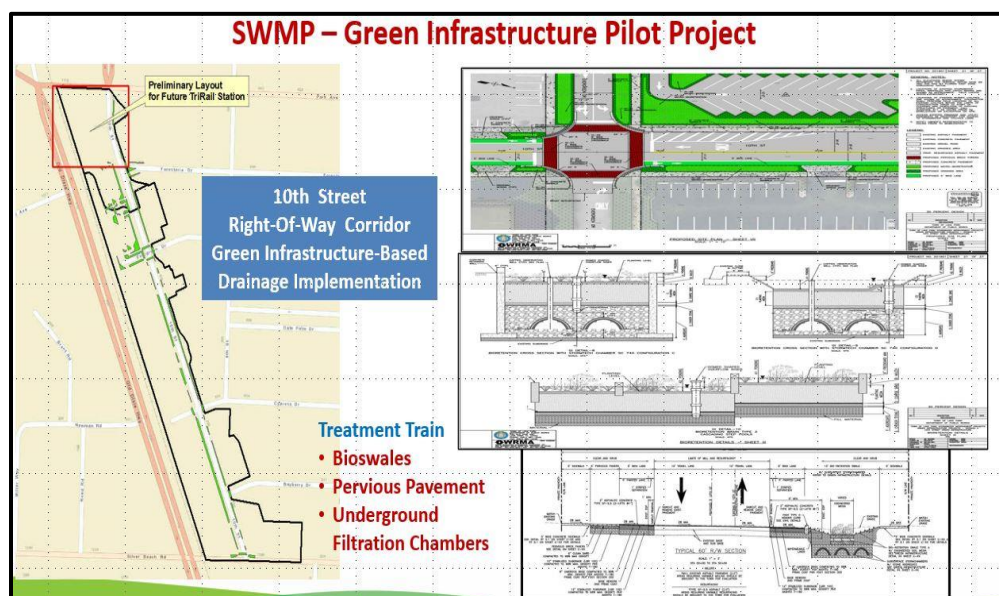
10th Street Bioswales BMP Pilot Project layout
